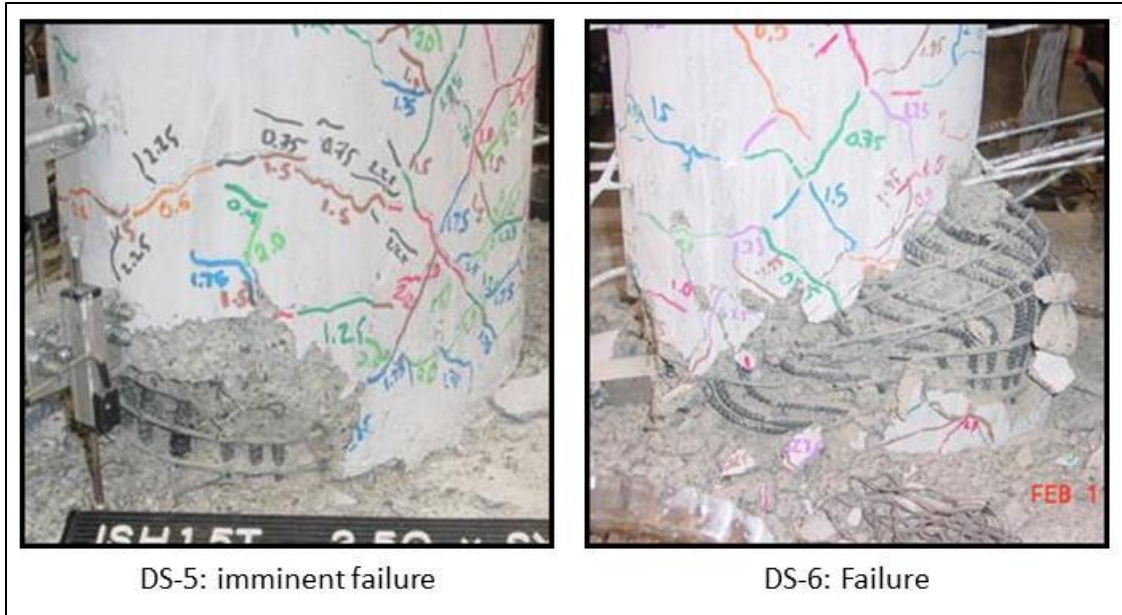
Damage States 5 and 6 - Apparent damage states in the RC bridge columns [20]
